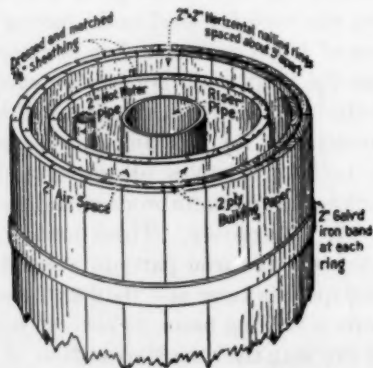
DESIGN OF EFFICIENT FROST-PROOF ROUND BOXING FOR ENCLOSURE OF RISER PIPE TO TANK CONNECTION
